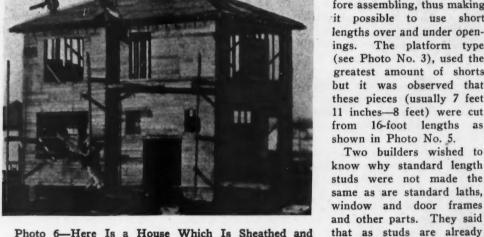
Here Is a House Which Is Sheathed and Roofed with 1-Inch by 6-Inch by 5-Foot 1/2-Inch Car Roofers.
